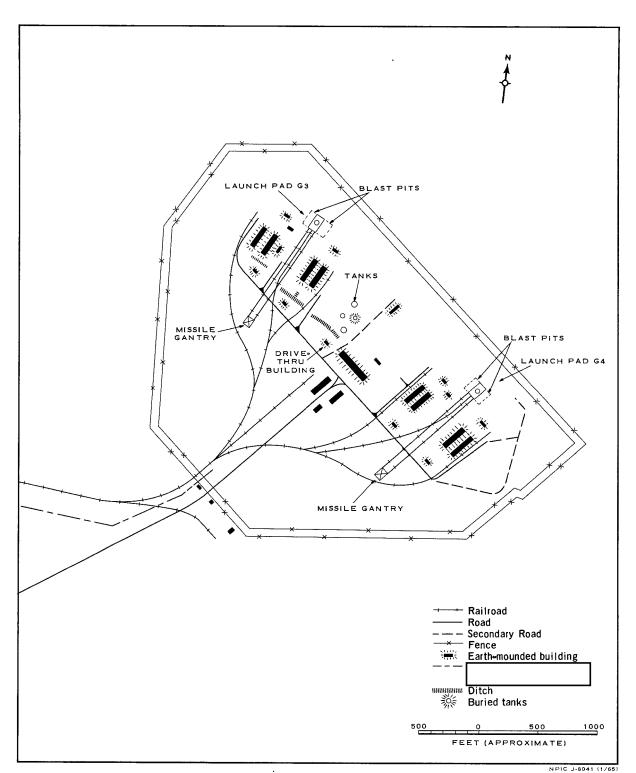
LAYOUT OF LAUNCH SITE G3/G4(11), TYURATAM.
